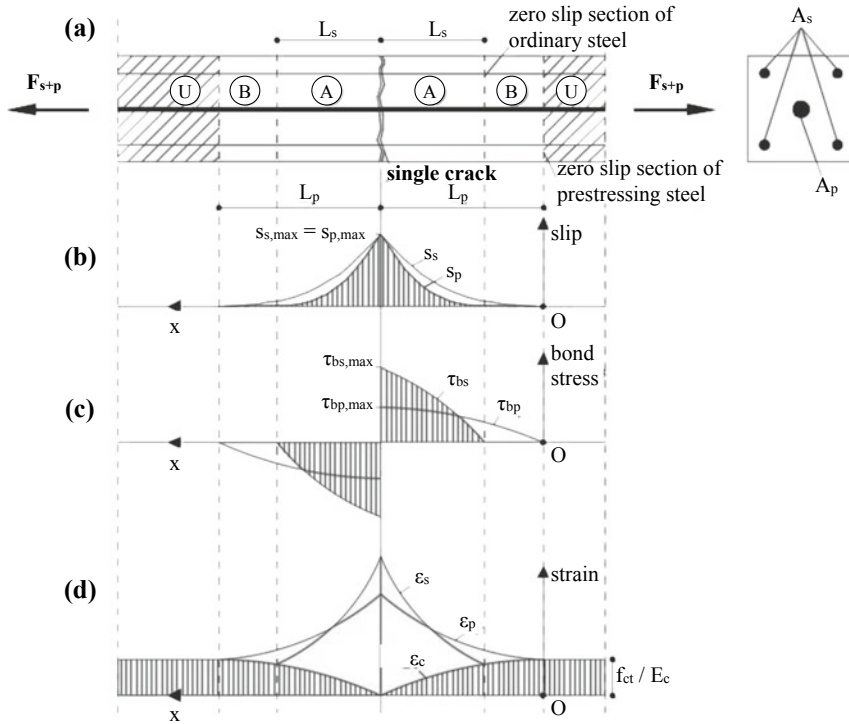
Crack formation stage: a concrete tie reinforced with ordinary and prestressing steels; b distribution of the slips; c bond stresses; d longitudinal strains of ordinary and prestressing steels and concrete
